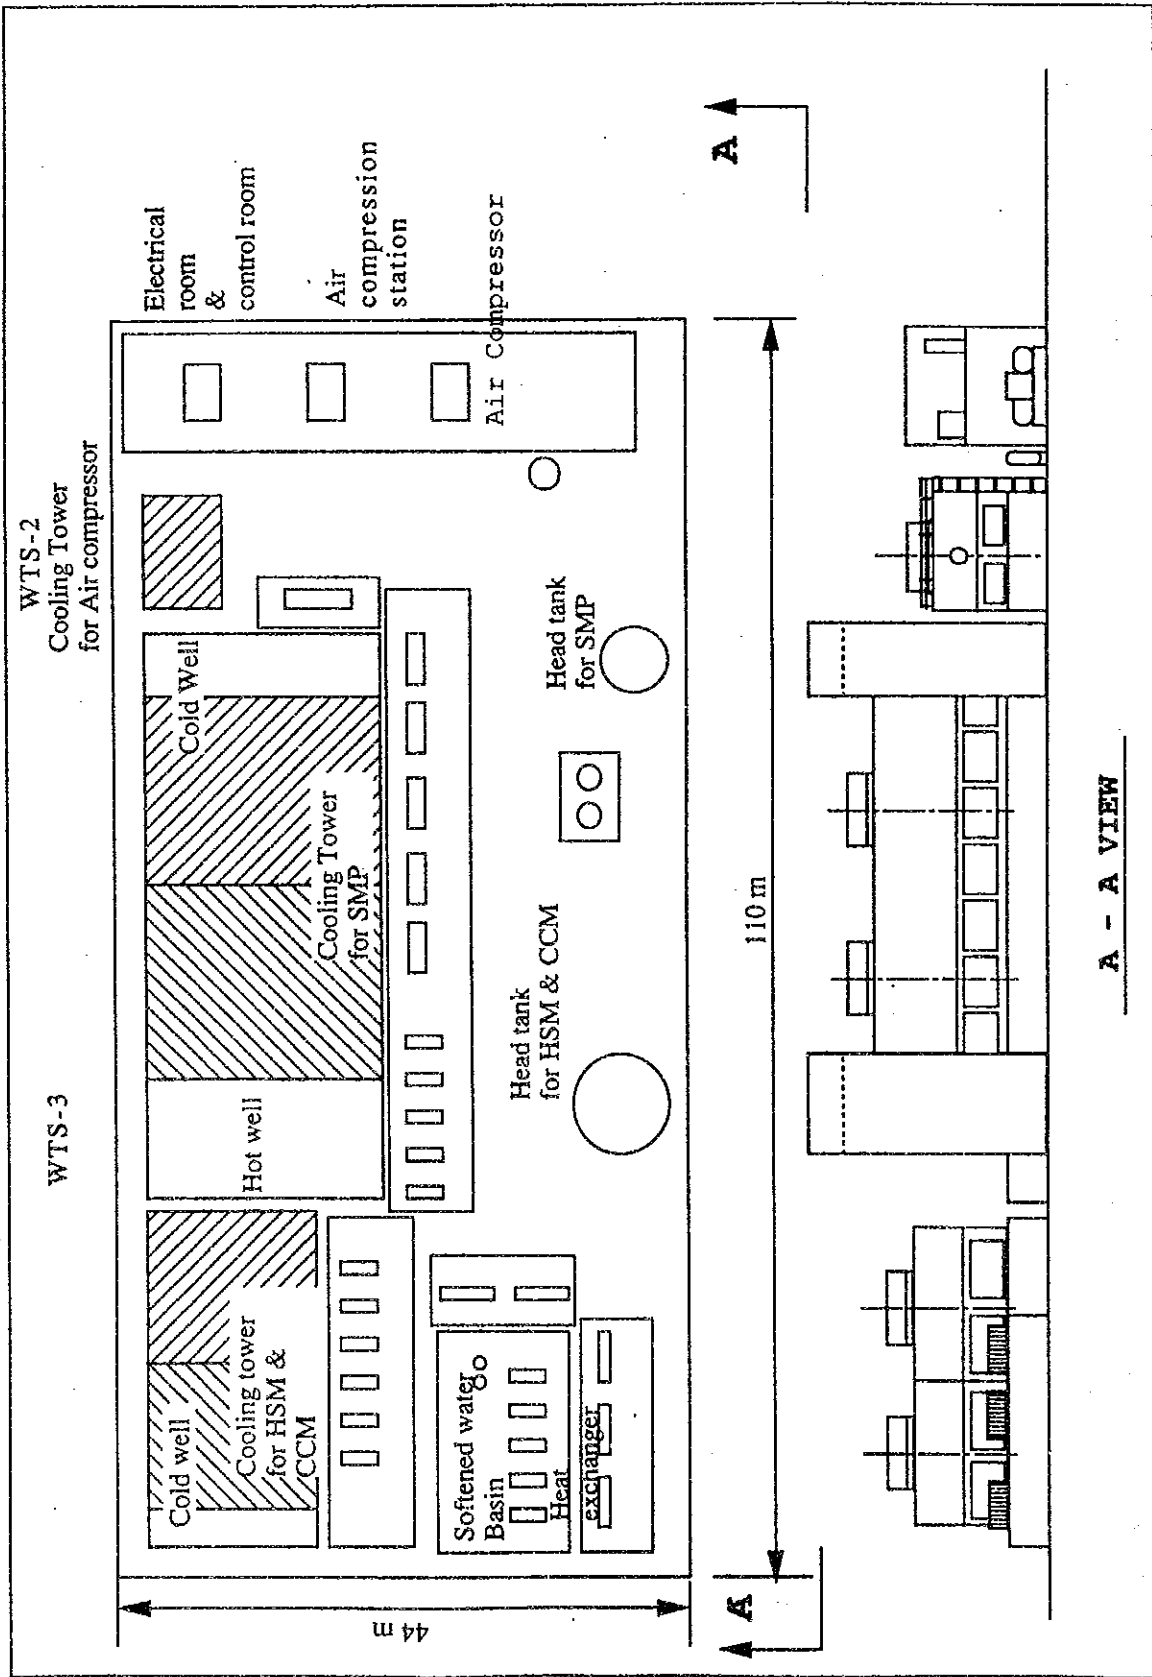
Layout Drawing of DCW Treatment Station
